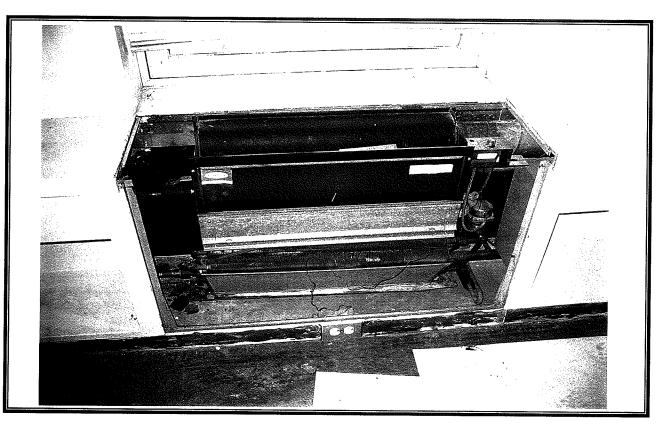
Photo Date 12/05/06 Midtown Tower - 6 th Floor. Typical perimeter induction unit
